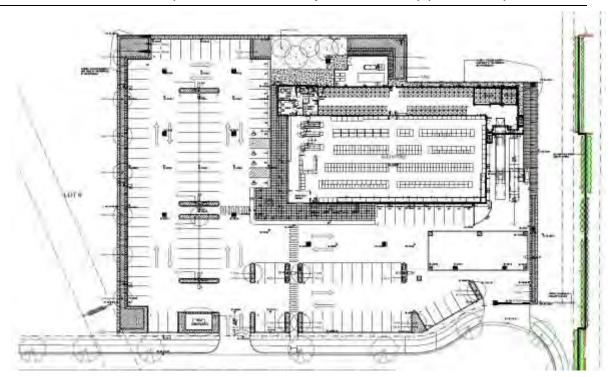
Proposed Aldi Landscape Plan (Source: Site Image)
